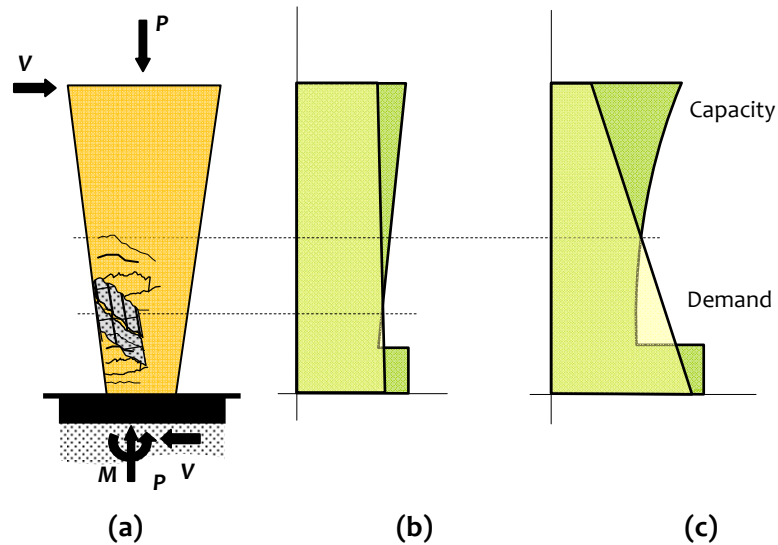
Shear failure in bridge piers: (a) pier subjected to equivalent seismic loading, (b) shear force diagram, and (c) bending moment diagram
